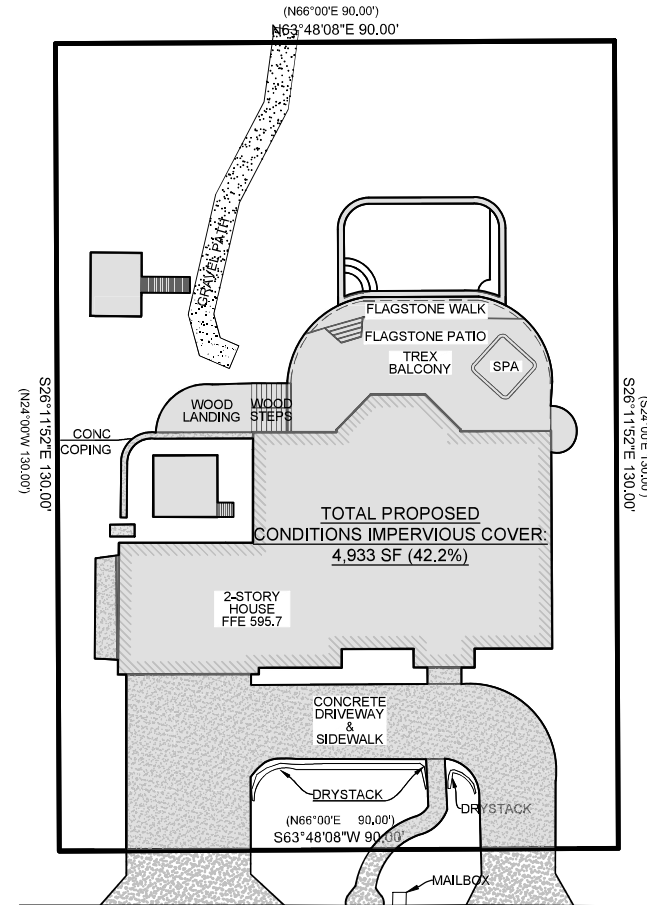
EXHIBIT DETAILING TOTAL EXISTING & PROPOSED IMPERVIOUS COVER
